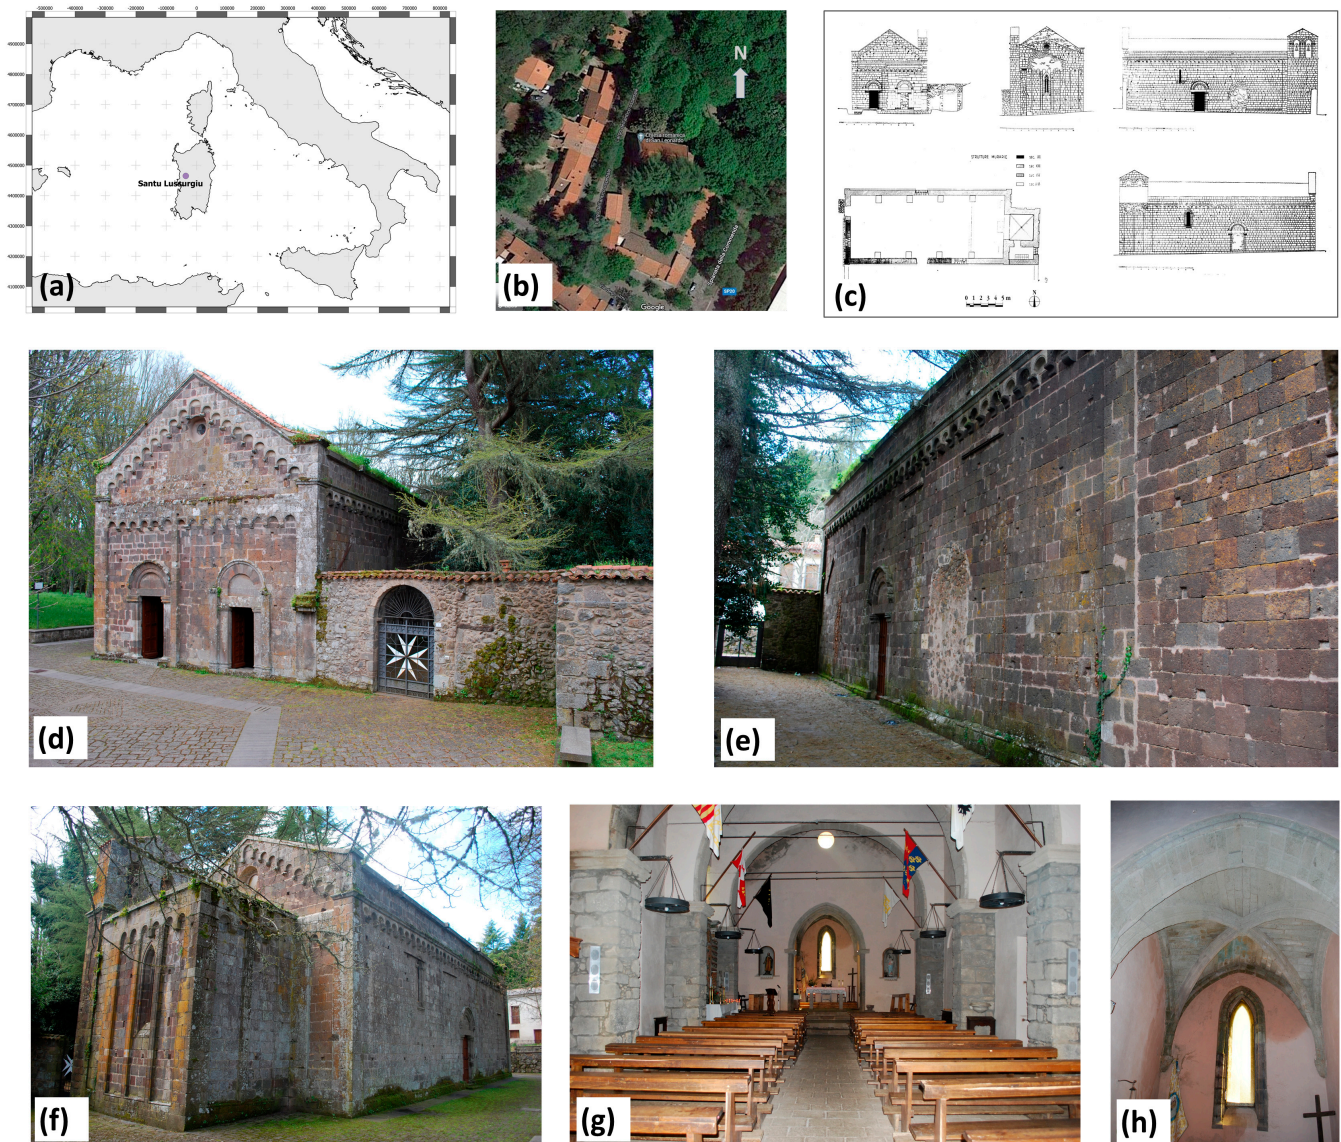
The church of San Leonardo de Siete Fuentes: localization of Santu Lussurgiu (a); aerial view of the church inside the wood of San Leonardo (b); plan view and elevations from a survey of 1952 (c) [65]; main façade to the East (d); southern wall with the walled entrance (e); north-eastern view with the rectangular apse (f); internal view of the nave (g); internal view of the cross vaulted apse (h).
